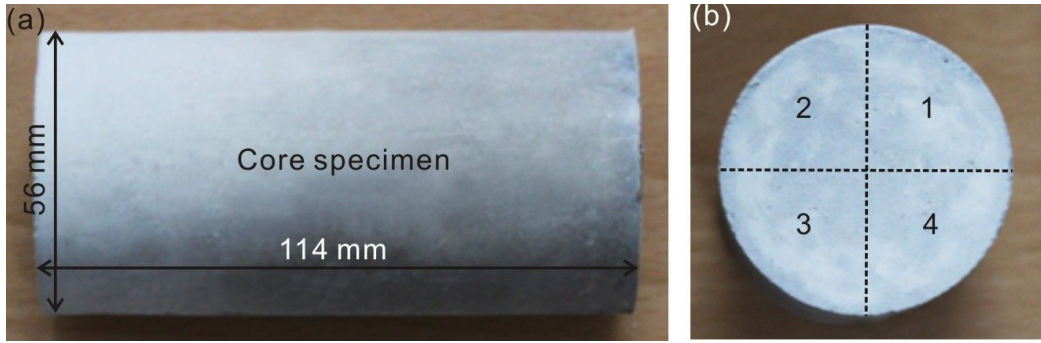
Core specimen for needle penetration test. (a) size of the core specimen, (b) test section of 4 quadrants.
